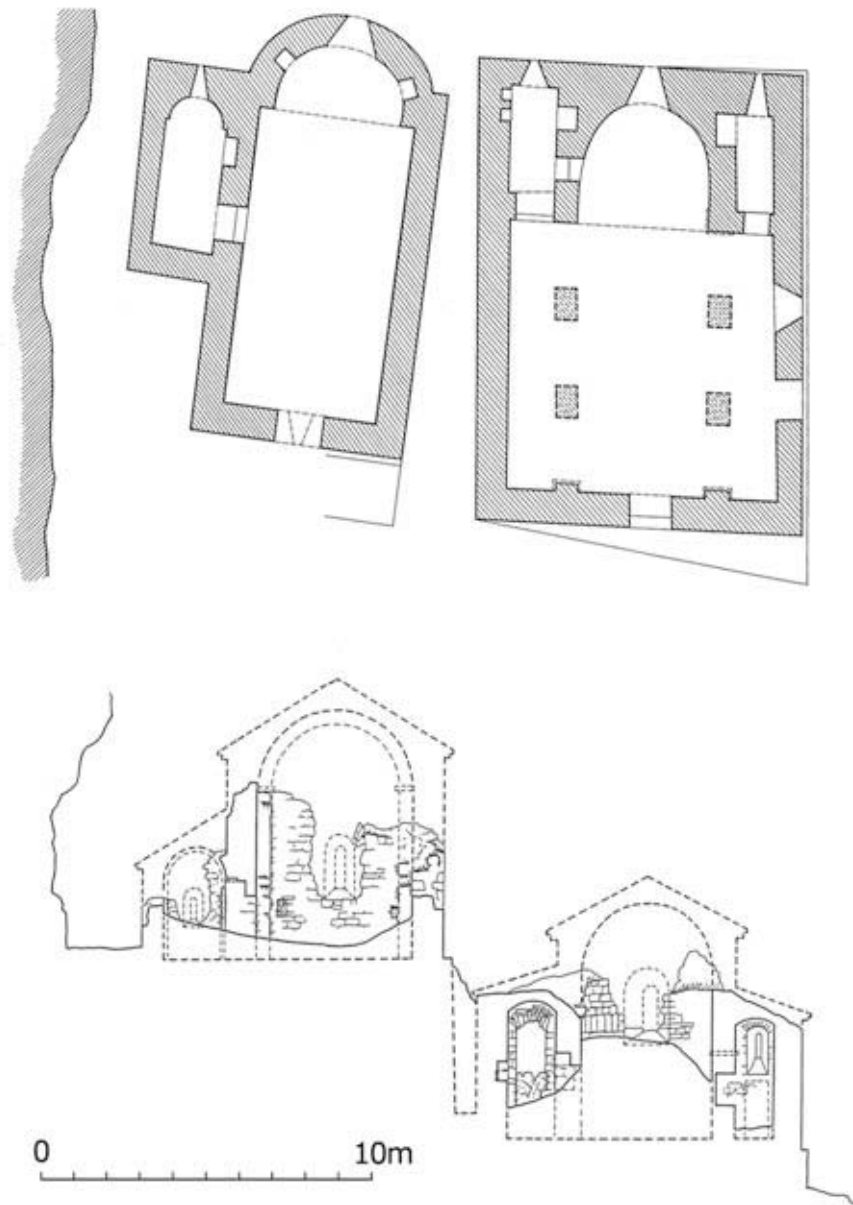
Parekhi. Two churches. Plan and cross-section looking east
